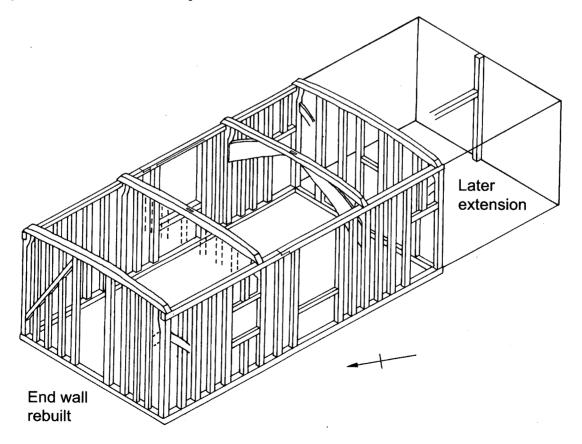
Cressing, Appletrees Farm Cottage, reconstruction of the timber frame (not to scale).
